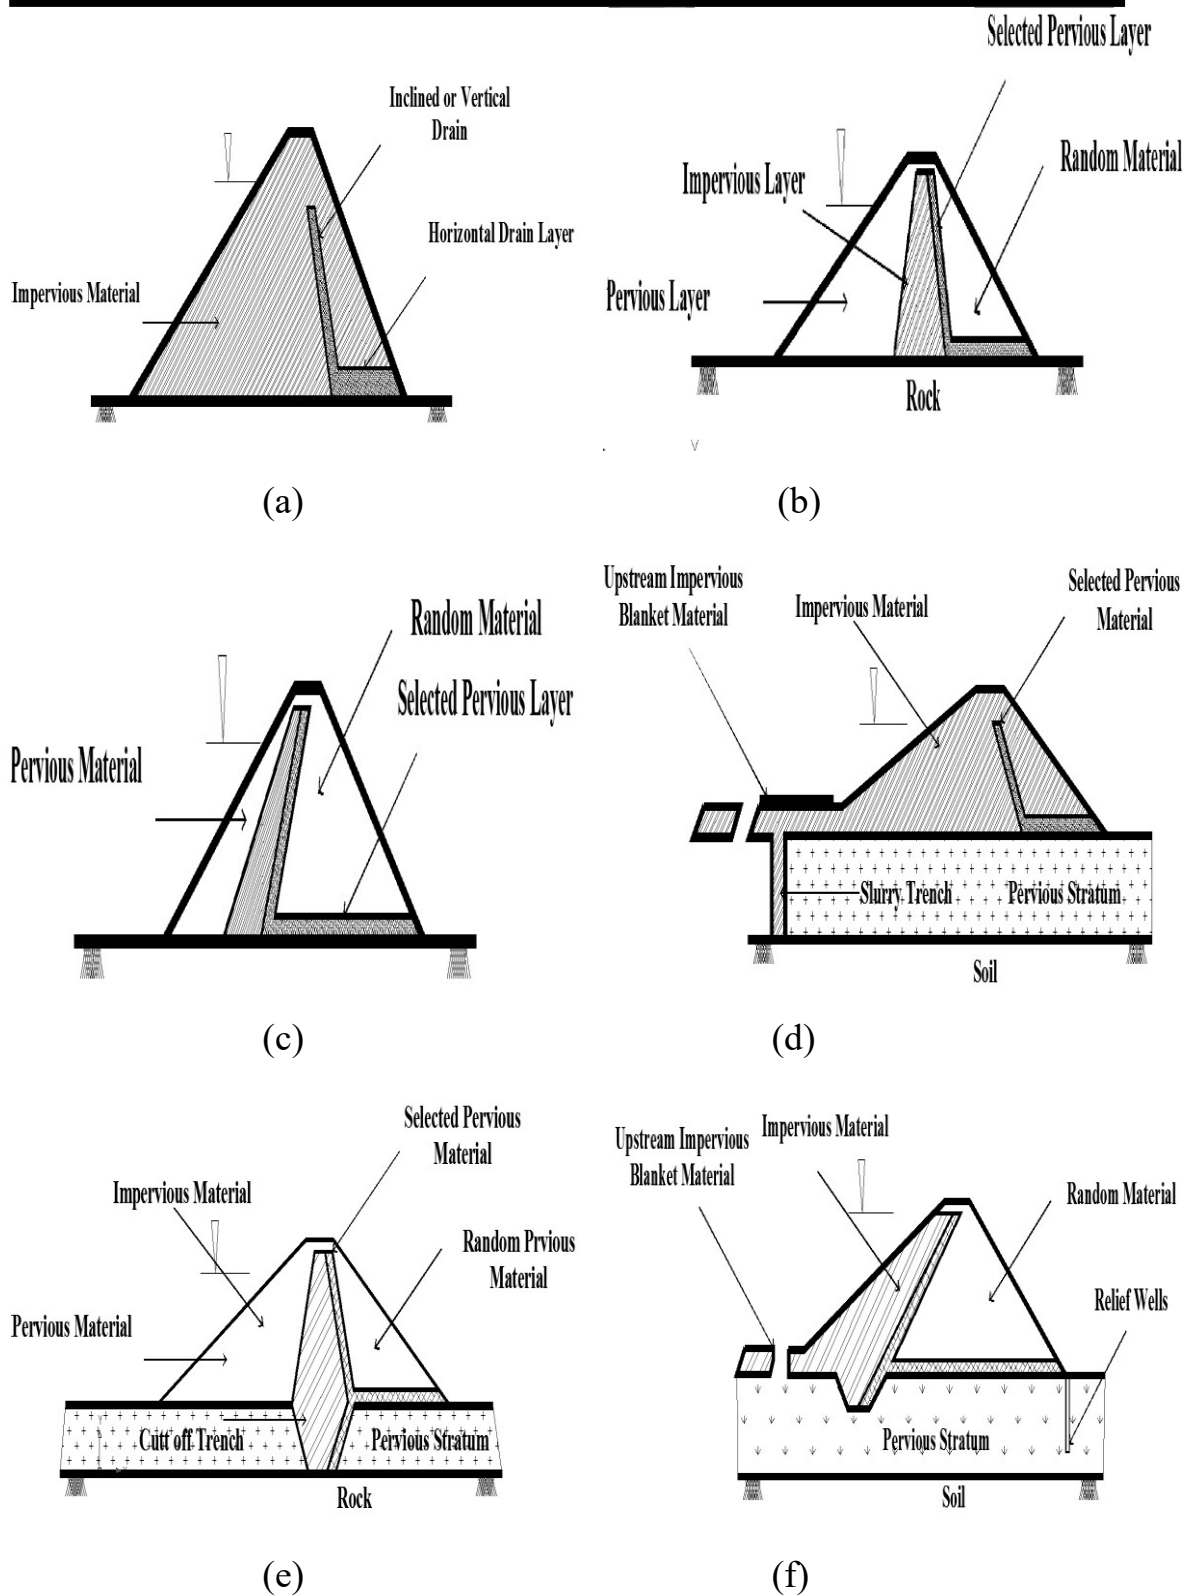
Types of Earthdam Sections: (a) Homogenous dam with internal drainage. (b) Central core dam on impervious foundation. (c) Inclined core dam on impervious foundation. (d) Homogenous dam with internal drainage on pervious foundation. (e) Central core dam on pervious foundation. (f) Dam with upstream Impervious material (after McMahon, 2004)
